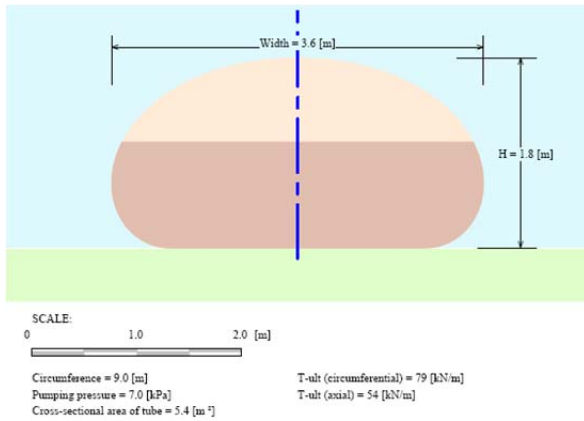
GeoCoPS; tube shape in cross-section; two-layer filling
